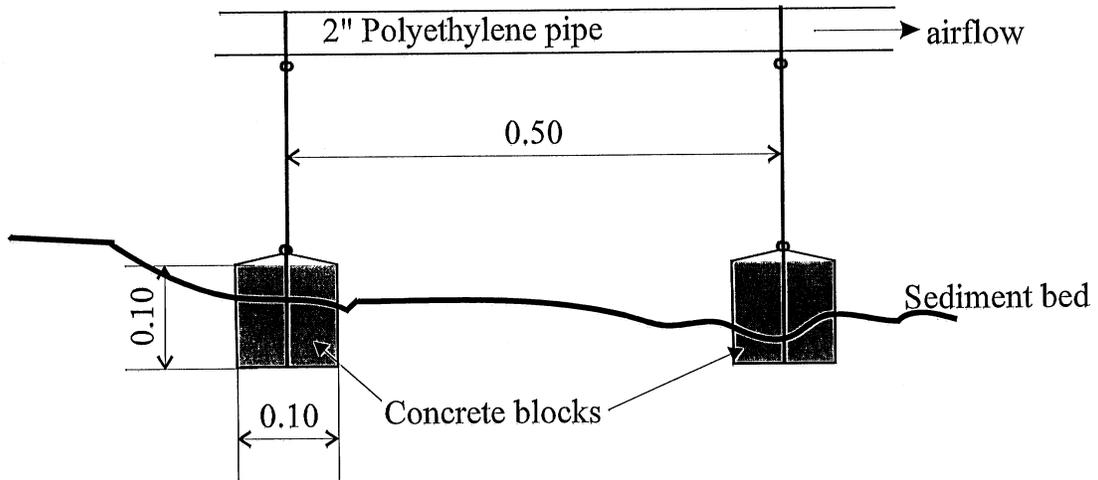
Layout of the anchoring blocks for the air pipes. All dimensions are in meters.
